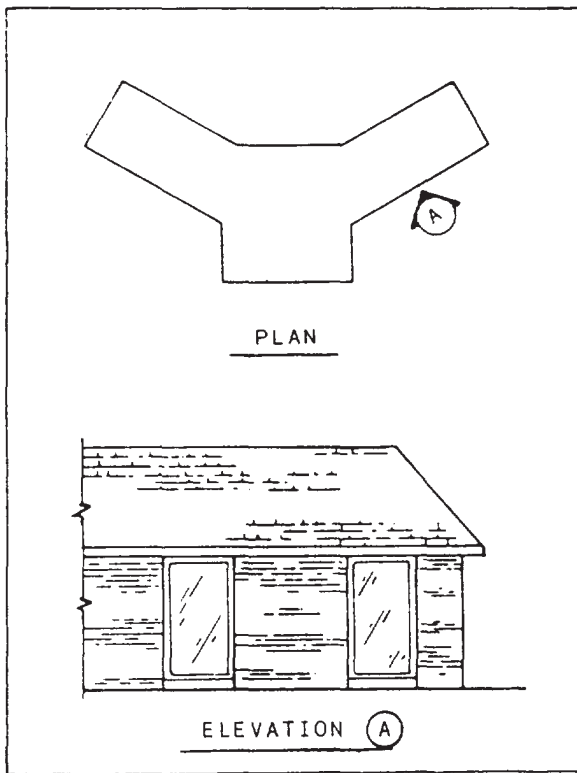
Labeling elevations for the plan shown in figure 10-14.
